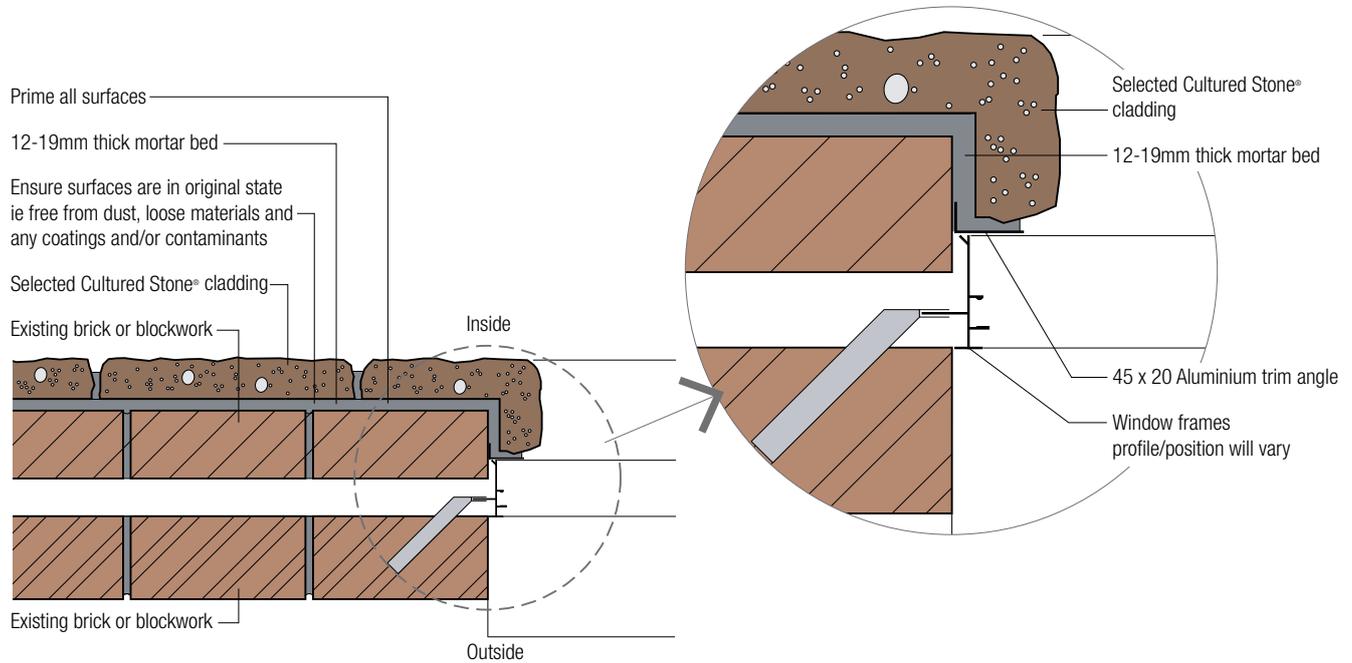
Typical Internal Existing Application - Plan (Dwg # CS-08.01)
